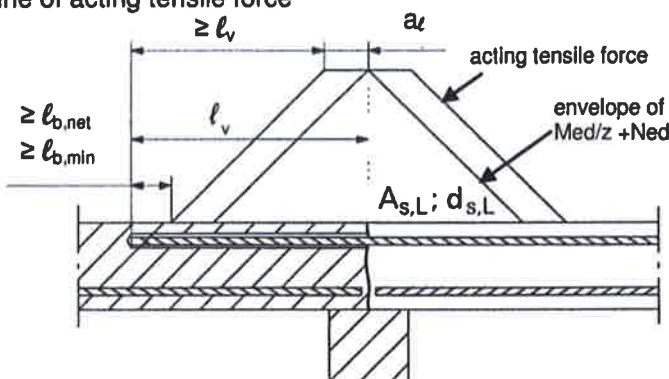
Overlapping joint at a foundation of a wall or column where the rebars are stressed in tension
